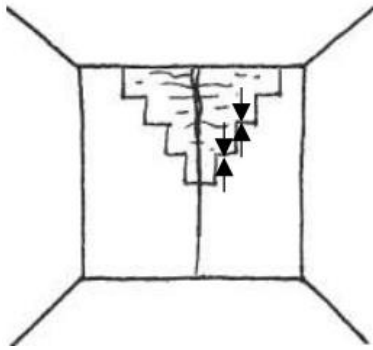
Renovation of the adobe wall by creating a work joint [15].
